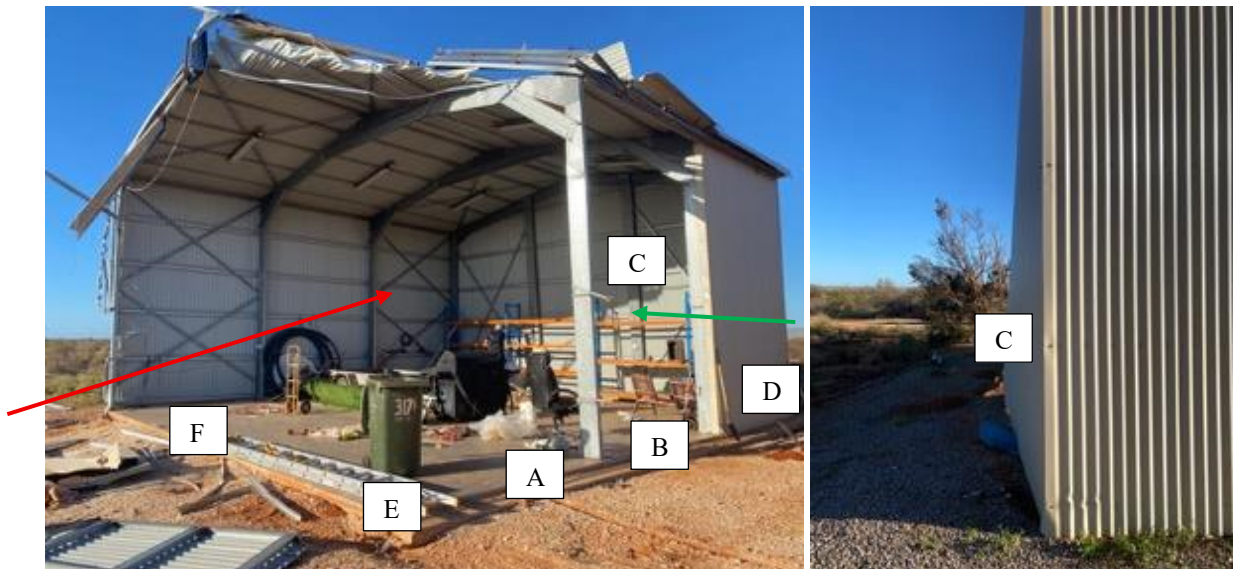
Failure of contemporary concealed fix roofing
